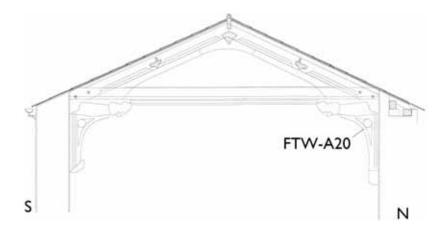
East elevation of truss 10 (based on truss 2), showing the location of sample FTW-A20 (Freeland Rees Roberts Architects)
